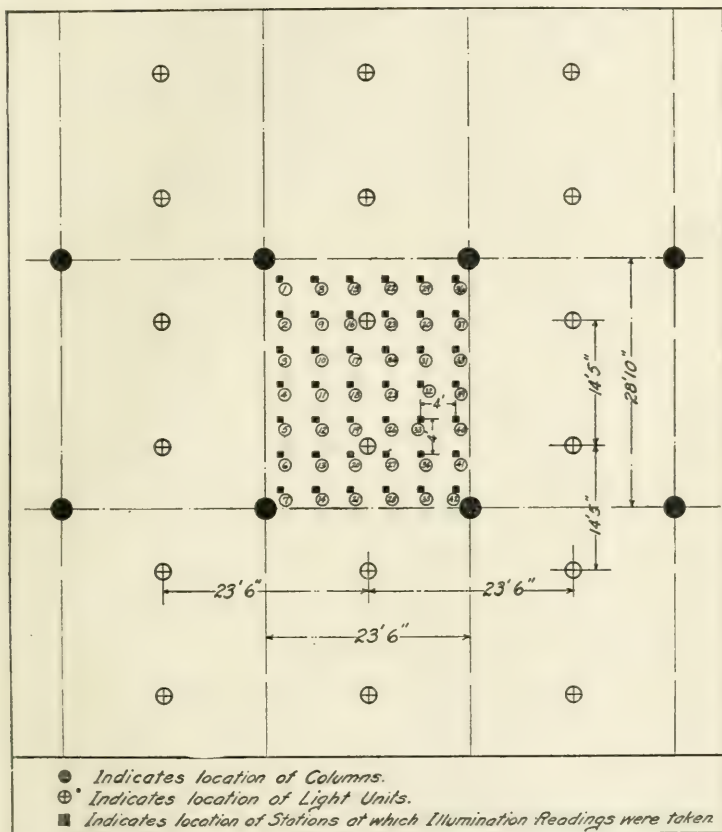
Section plan of third floor showing location of illumination test stations.
